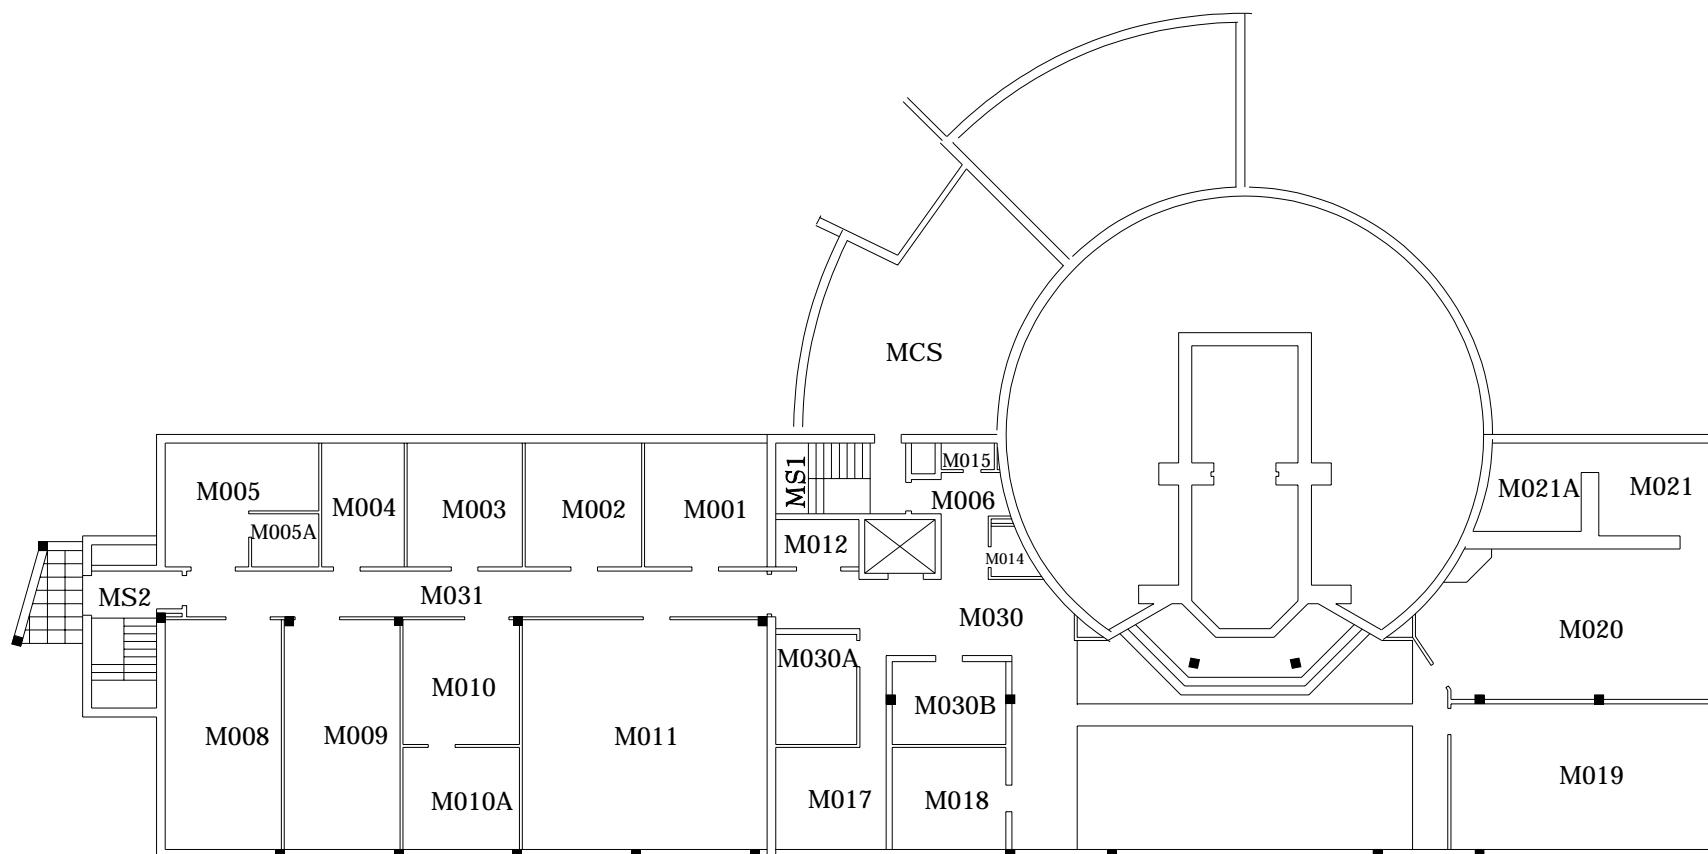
UVA Reactor Mezzanine Floor Plan View
